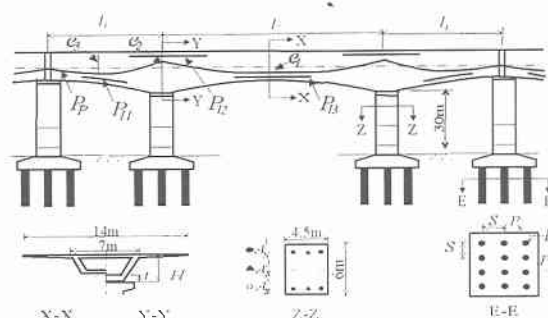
Design variables of a three-span continuous prestressed concrete bridge system
